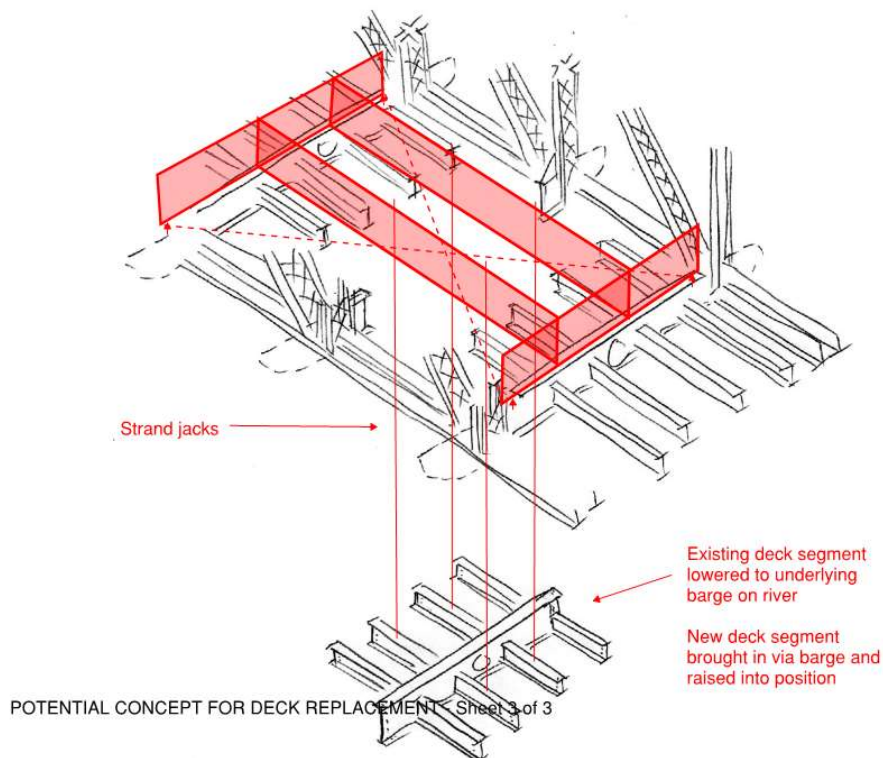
Sketch illustrating the proposed methodology for replacing the deck structure.
